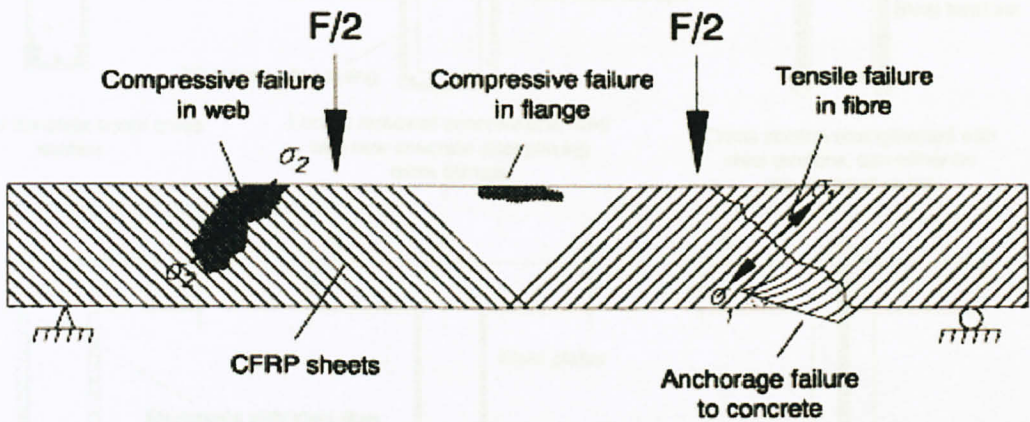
Possible failure for a strengthened concrete beam
